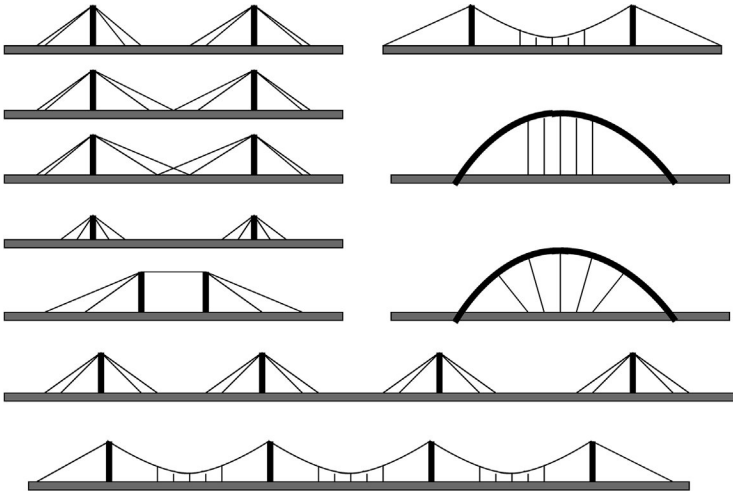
Various alternatives of a cable-supported girder bridge.
